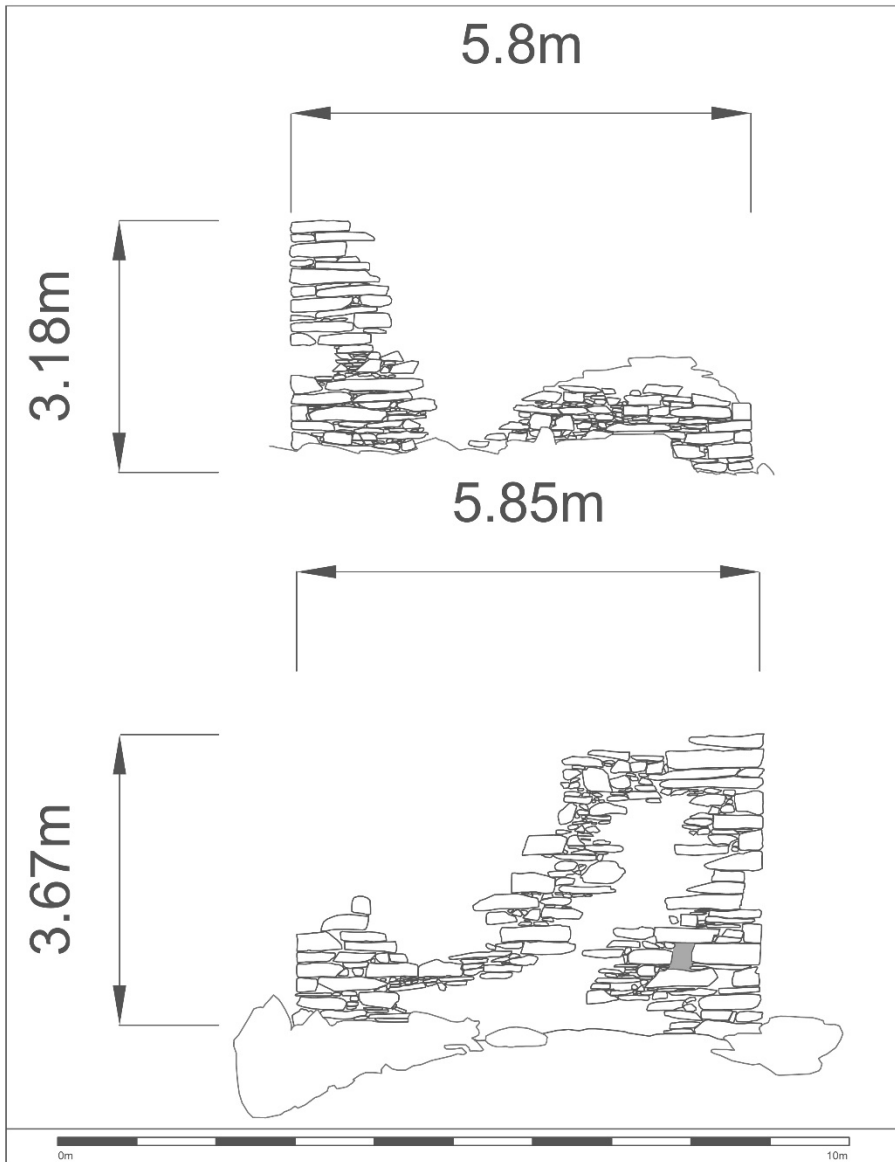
External elevations of south (top) and east (bottom) walls of Inishturk Signal Tower. The chute passing through the east wall into the ground floor alcove is shaded grey.
